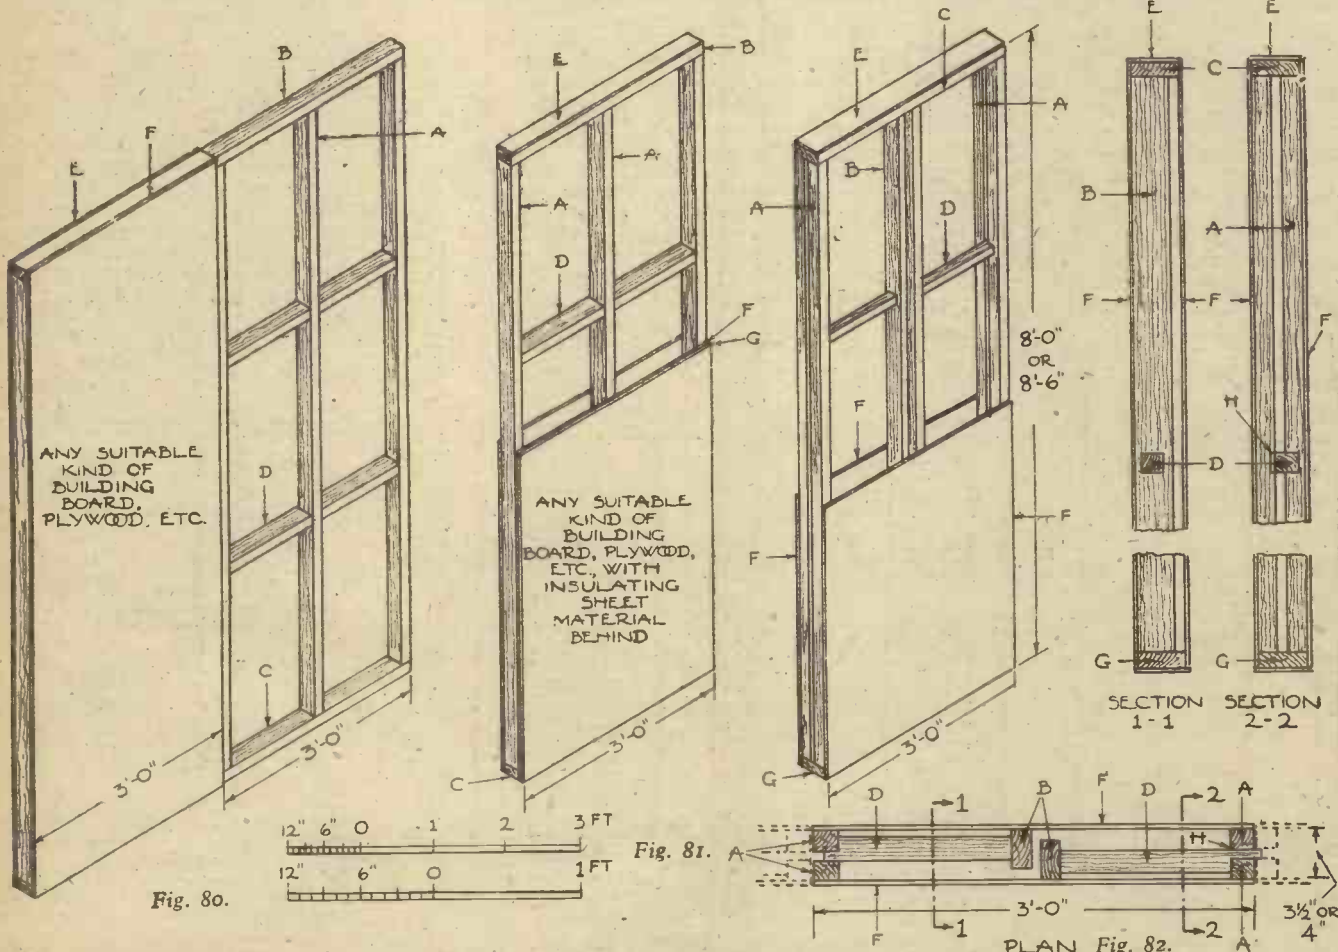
THE SIMPLEST TYPE OF PRE-BUILT TIMBER-FRAMED PARTITION WITH 3ft. WIDE by 8ft. or 8ft. 6in. HIGH UNITS. A—Studs. B—Head. C—Sill. D—Noggings. E and F—Front and back coverings or claddings.
